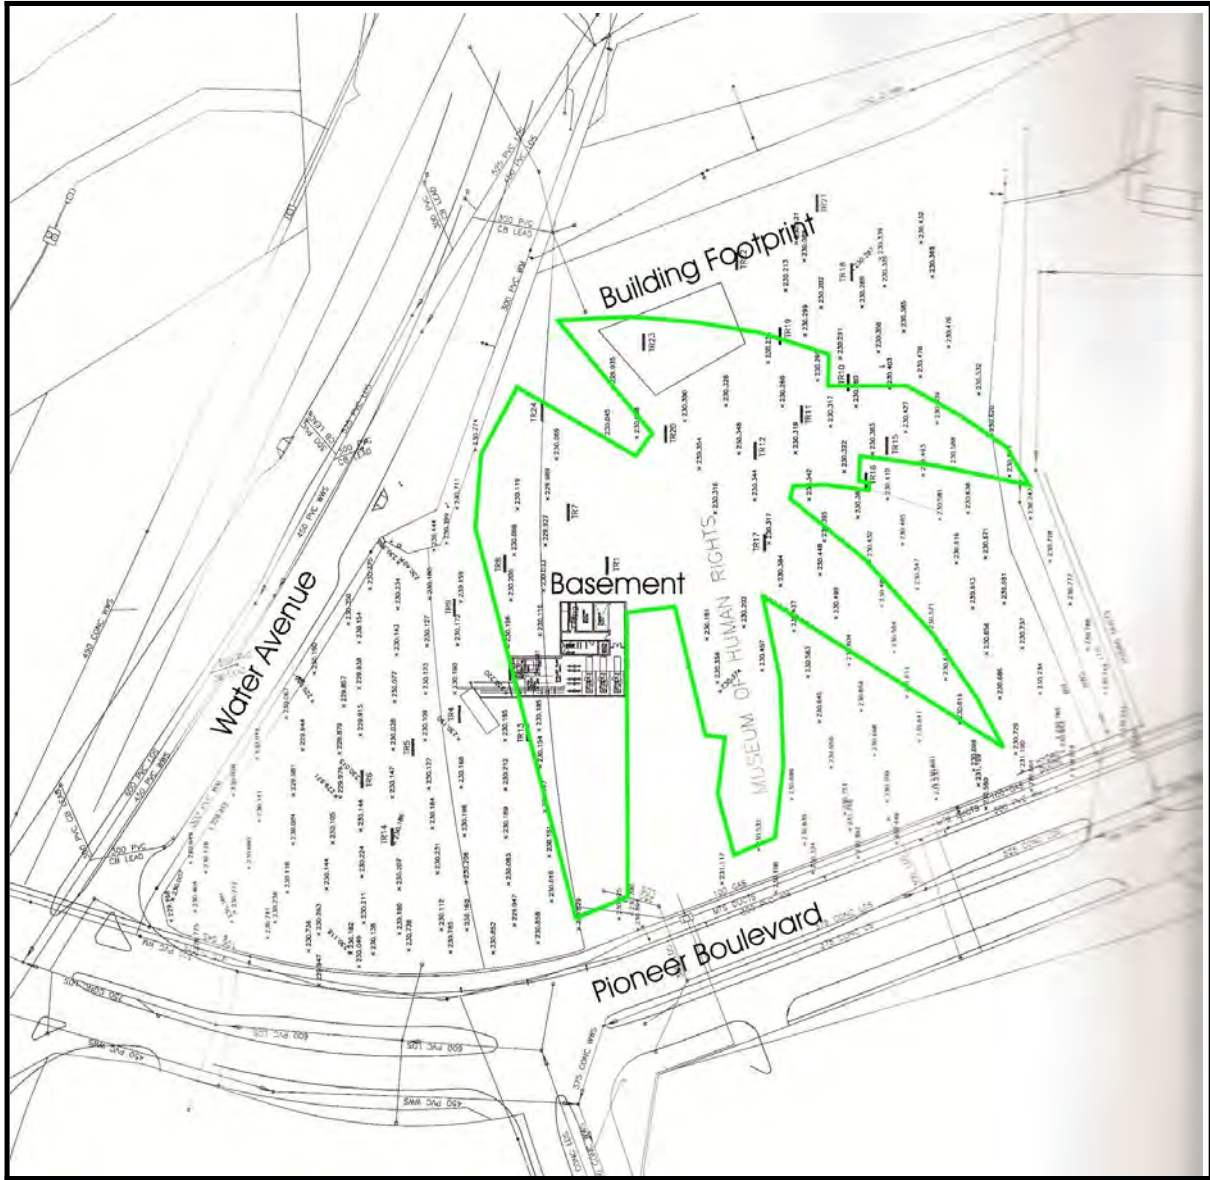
Building Footprint and Basement Superimposed on Site Map with Elevations
